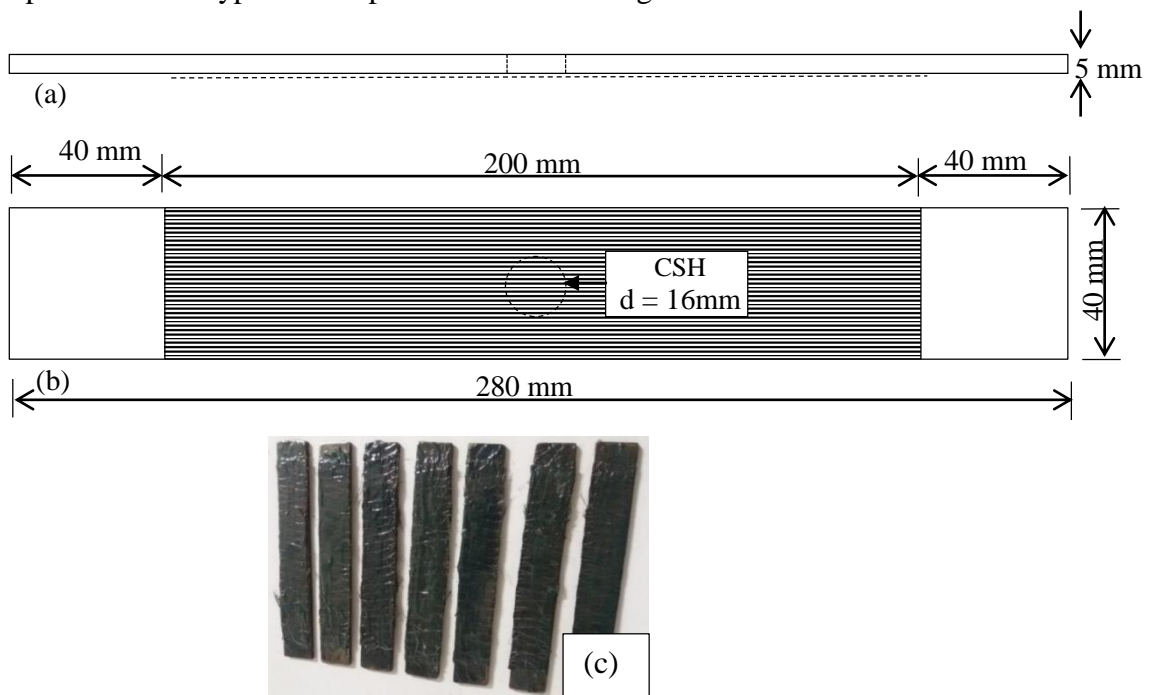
Schematic view of the non-conditioned CFRP-strengthened specimen (Scale 1:2) (a) elevation (b) plane view (c) typical specimen
